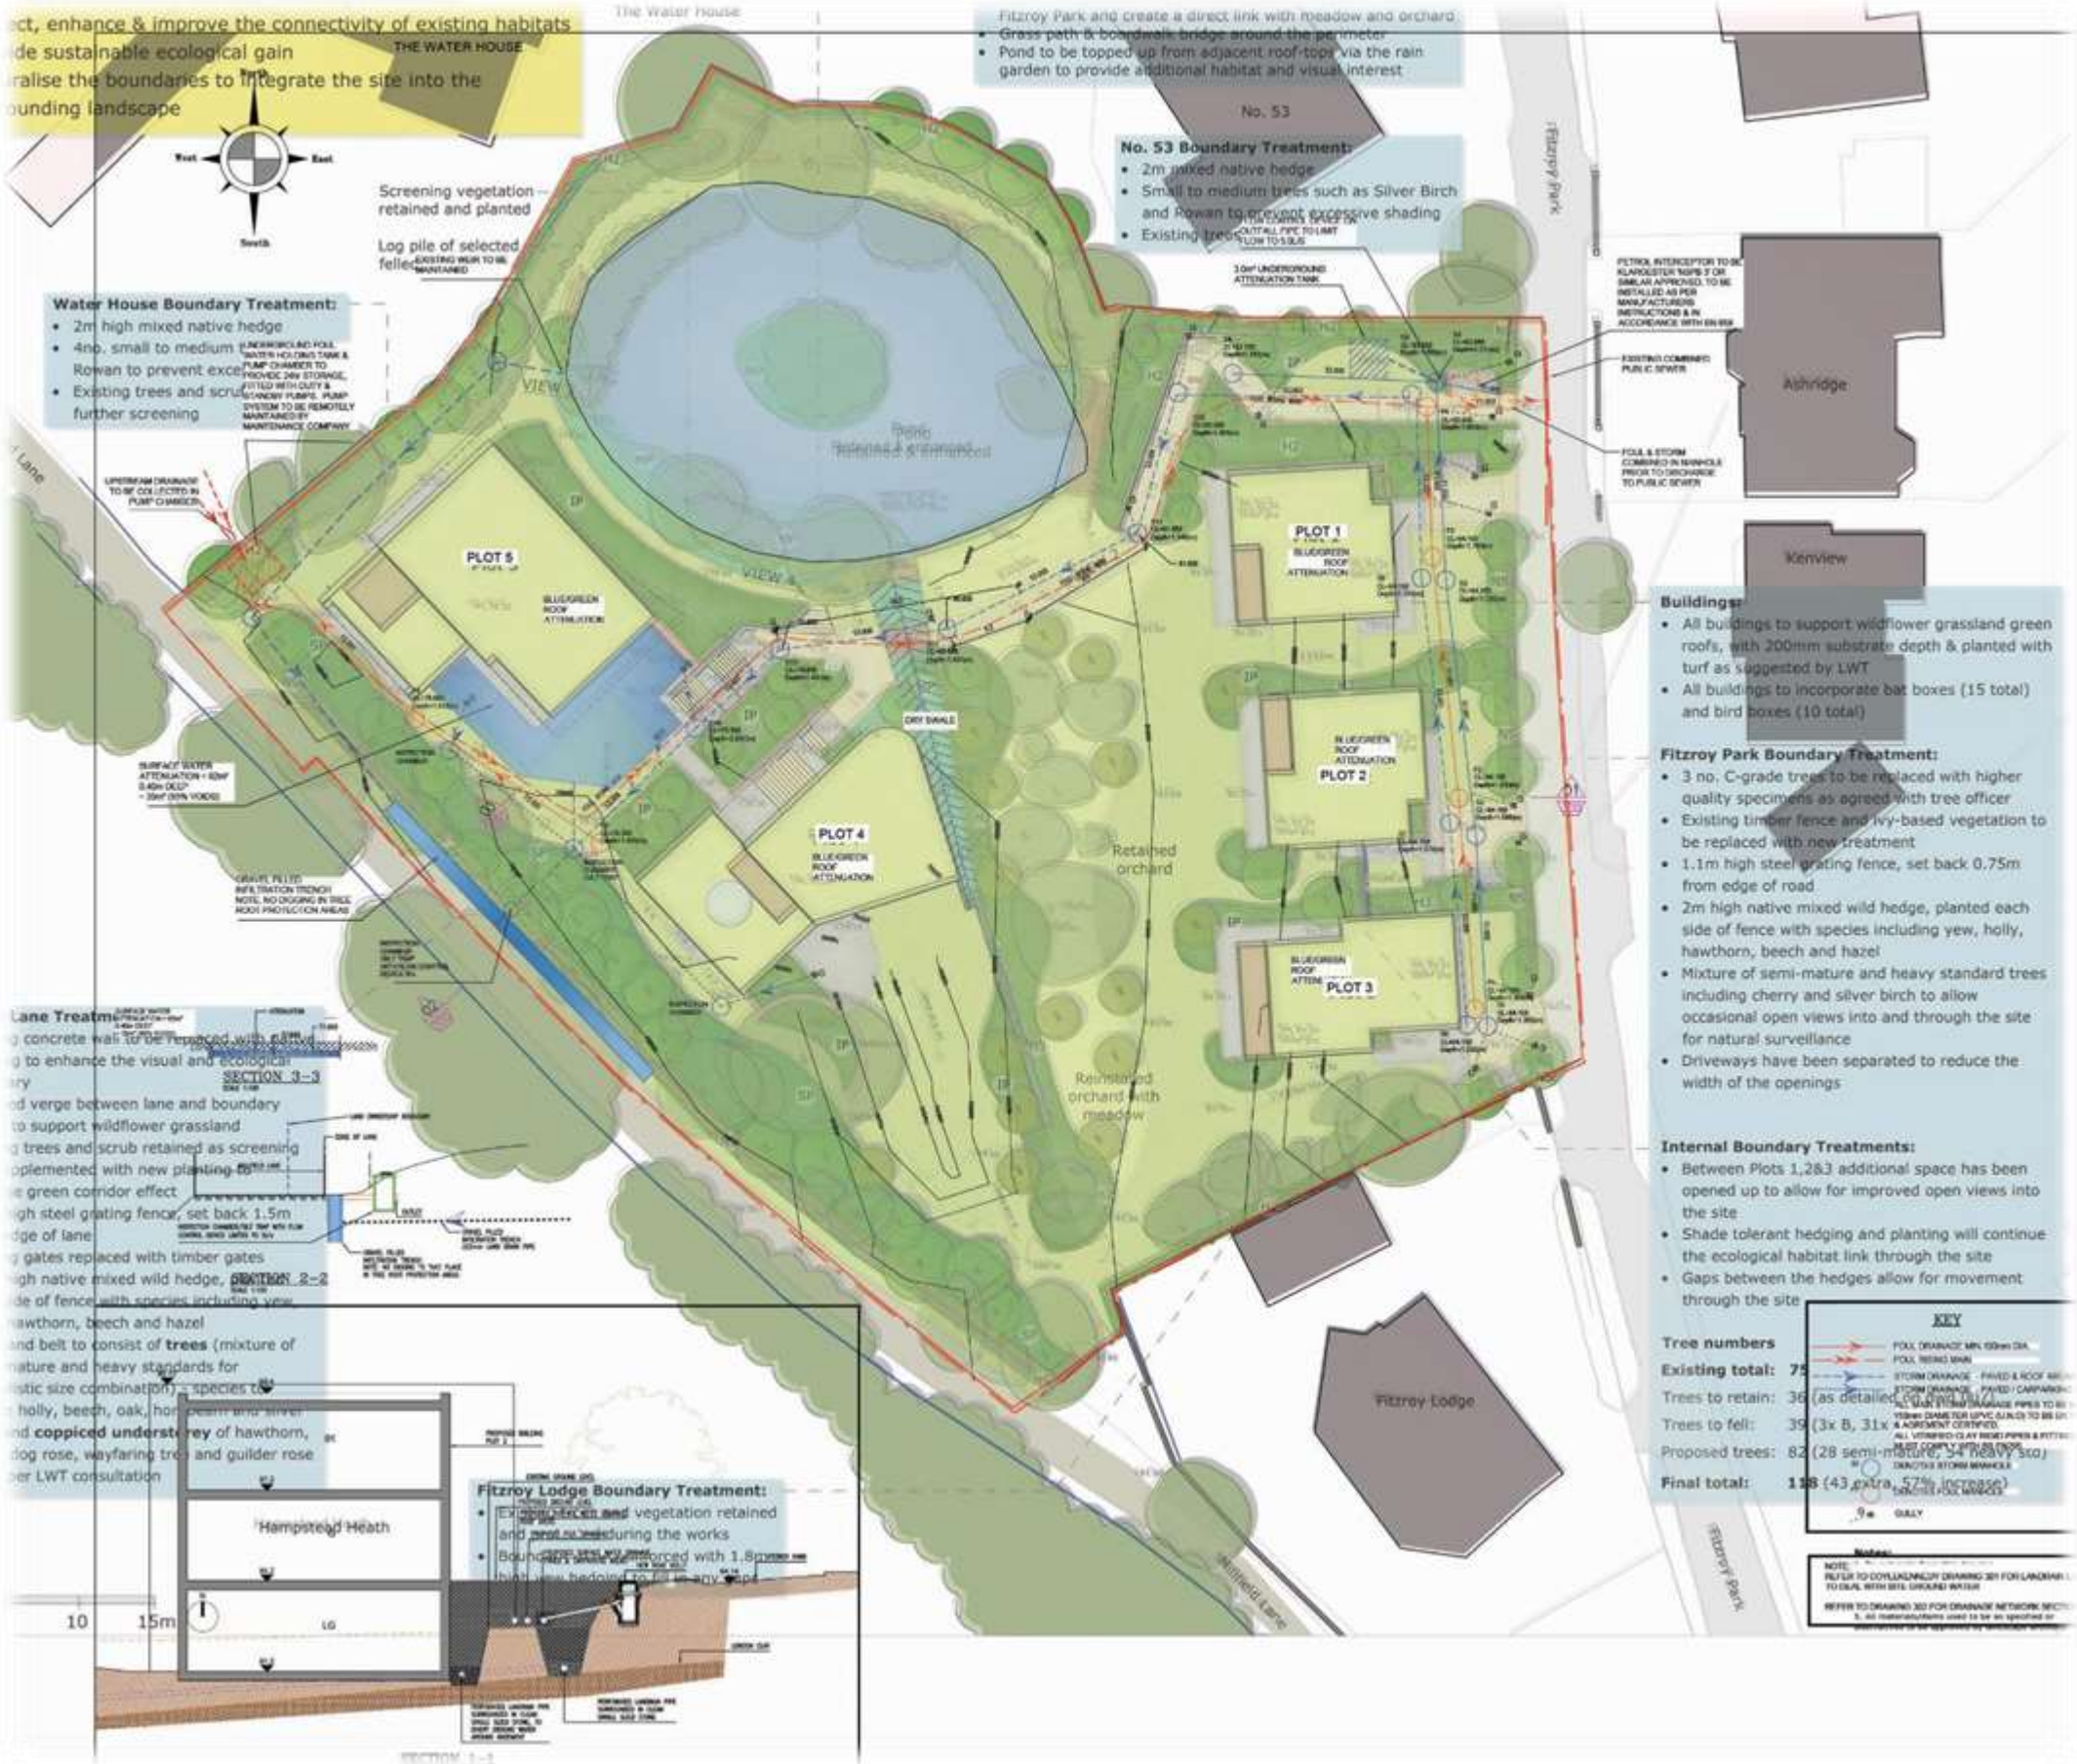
DRAINAGE LAYOUT OVERLAID ONTO PROPOSED LAYOUT
